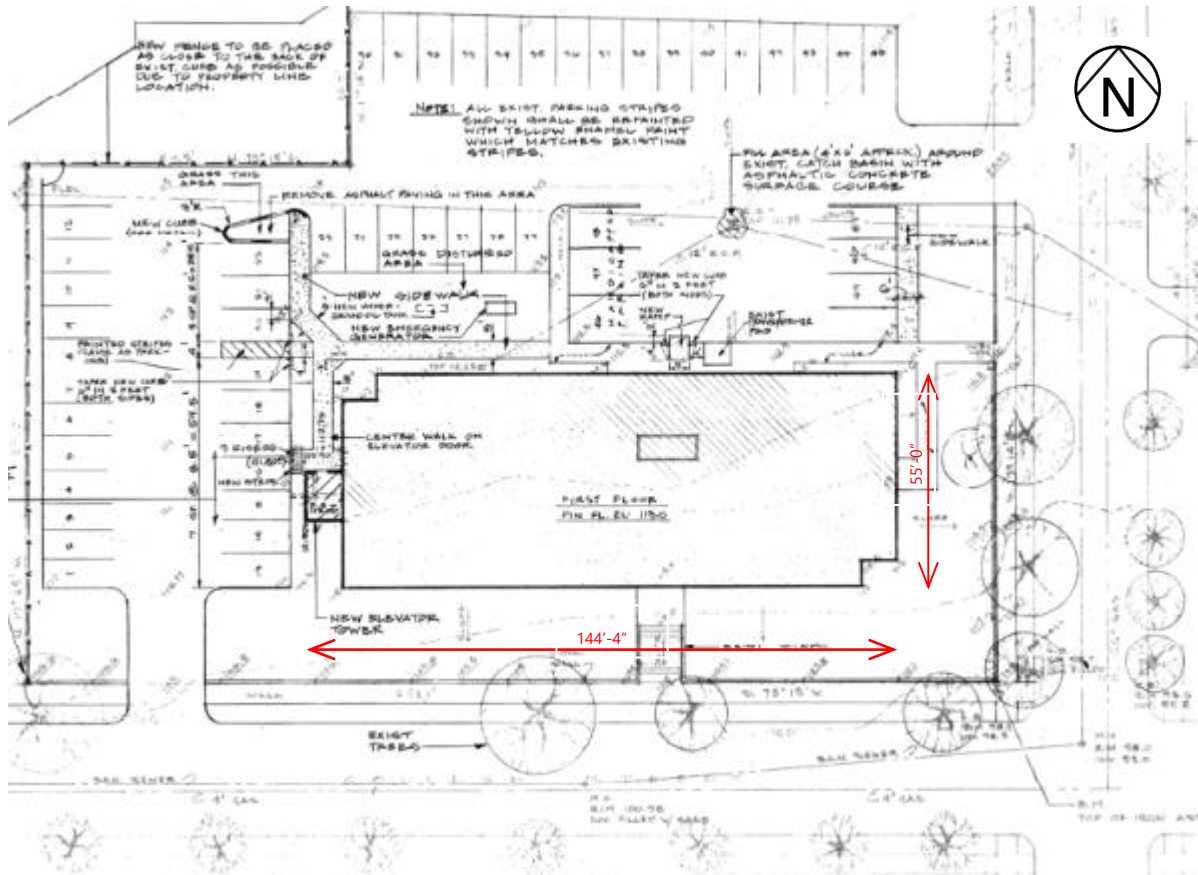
Plan view of Arrington Manor building located at 2225 College Street in Columbia, South Carolina
